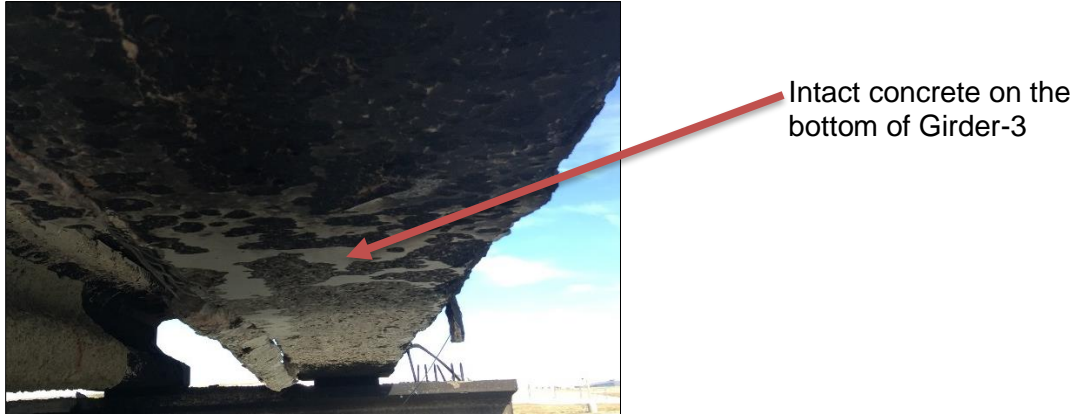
reference point used for measuring the elevation of the mid-span of Girder-3 after the fire
